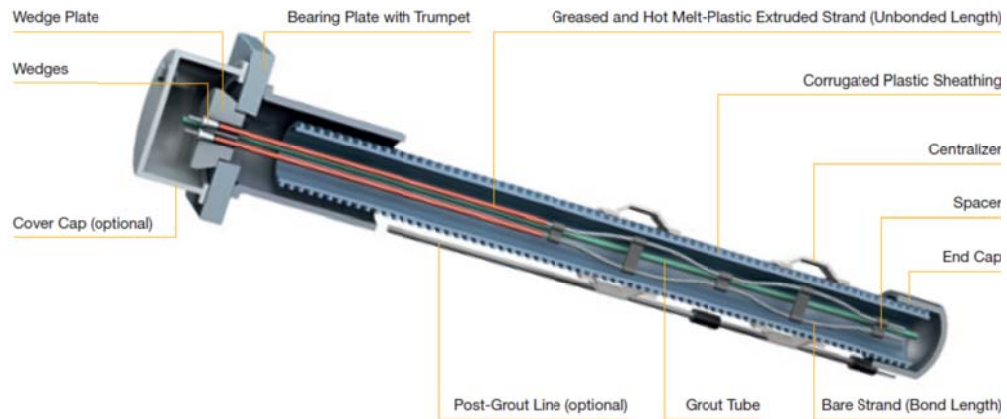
Commercial tie back anchor system (DSI USA Geotechnical Product Guide)
